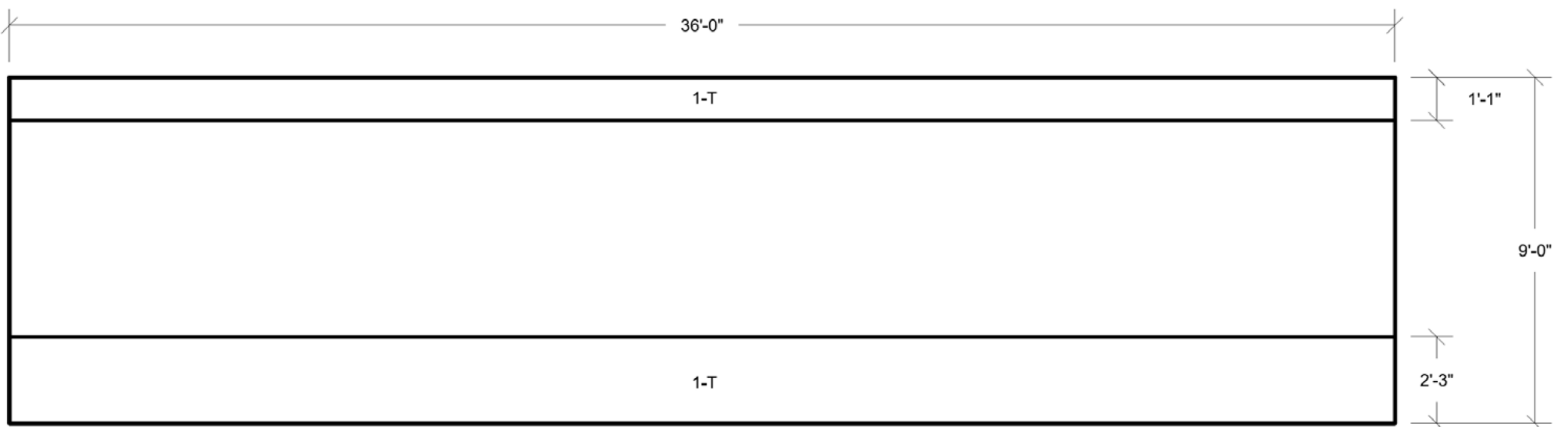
H.7-14A Tunnel Walls Looking From Outside Transverse Reinforcement Zones
